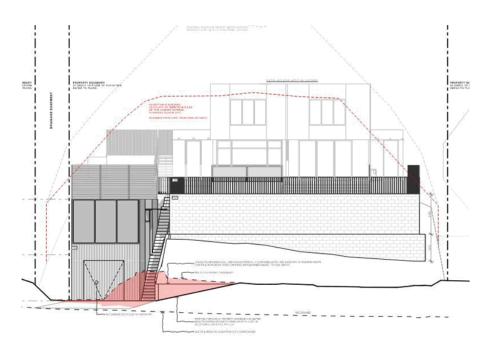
Front (east) elevation showing proposed studio and retaining structures along frontage (Crump Architecture, 2022)
